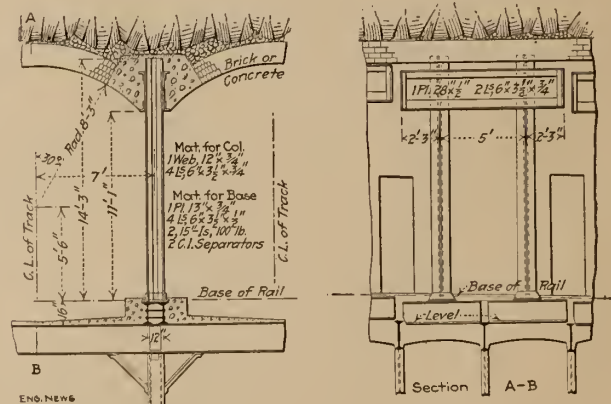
ALTERNATIVE DESIGN FOR CENTER WALL USING STRUCTURAL STEEL INSTEAD OF REINFORCED CONCRETE
